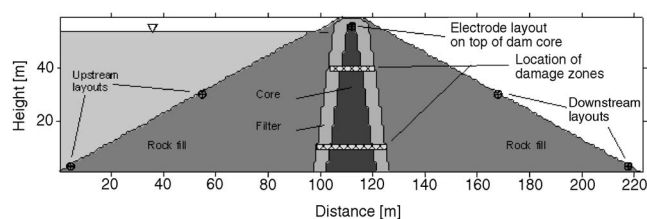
The modeled cross section geometry. A zoned, rockfill embankment dam with a central till core and surrounding filter zones. Electrode layouts and damage zones that are used in the study are marked out.
